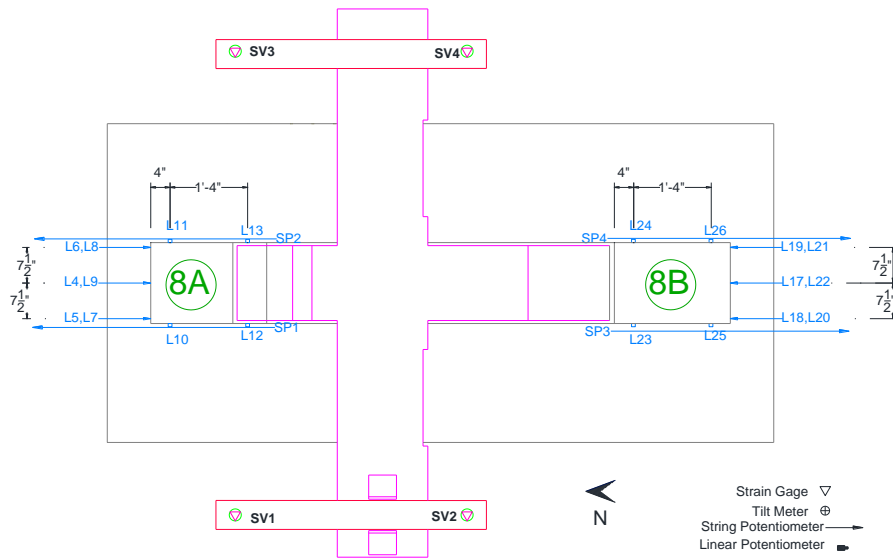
Plan view of external instrumentation for Specimens 8 and 10
